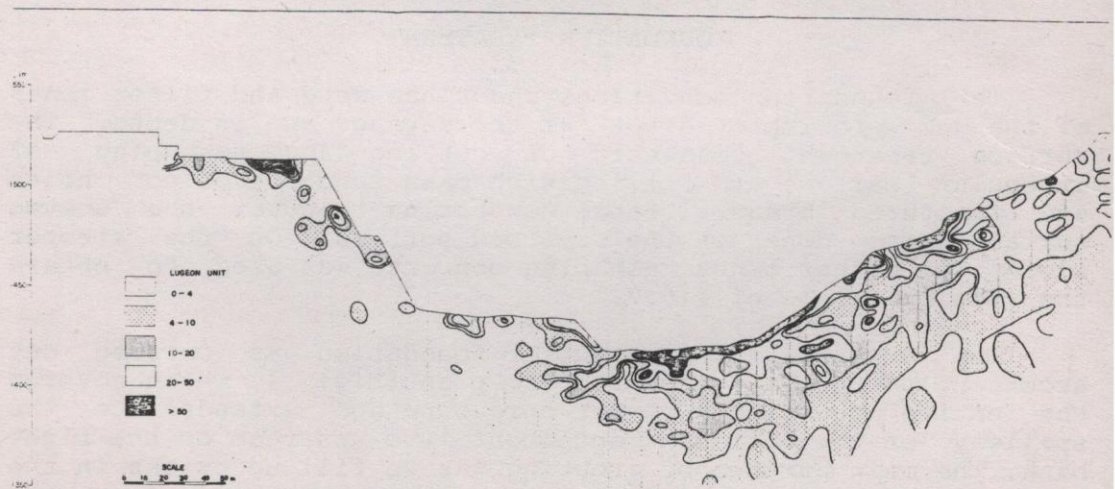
Permeability Profile of Main Dam Curtain Grouting, Secondary Holes
